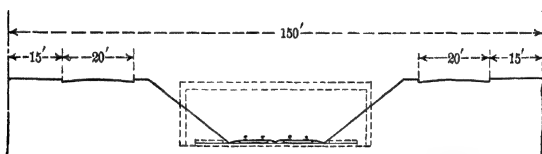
Showing open cut for double-track rapid-transit railroad with side slopes in a street 150 ft. wide; to be converted into a four-track underground road when necessary.
